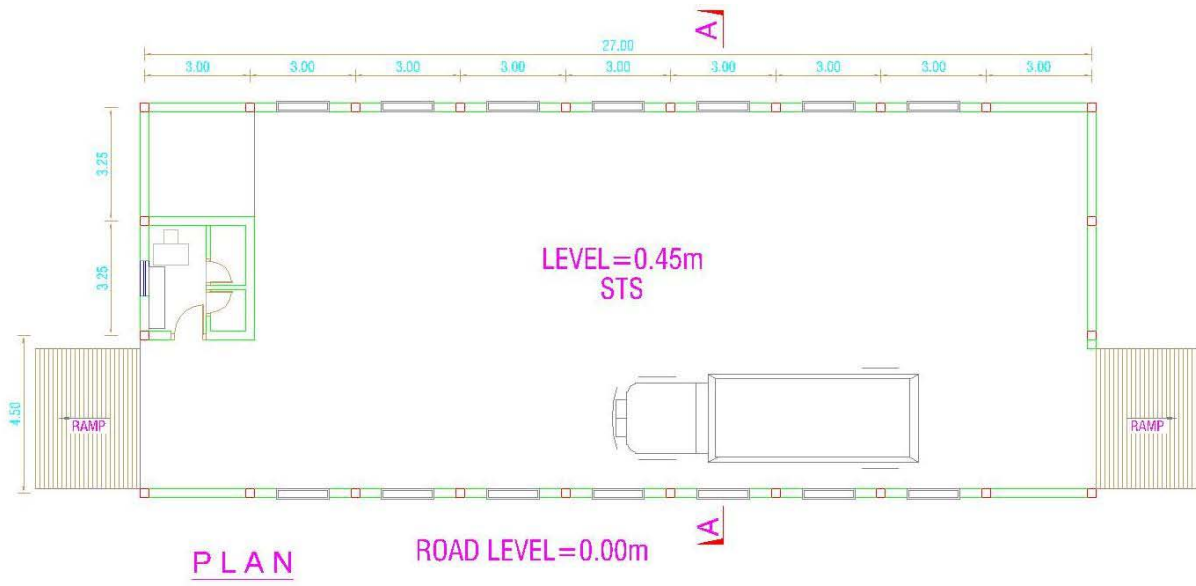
STS – 11 Golapshah Mazar Gulistan Preliminary Plan
